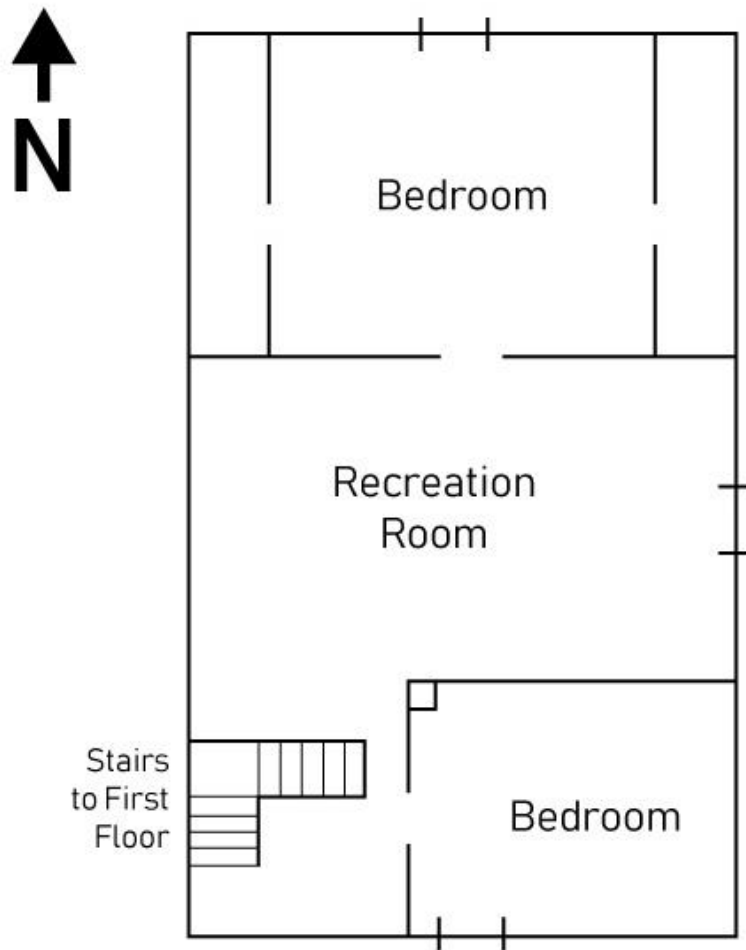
Second Floor Plan, Lloyd A. Barbee House
